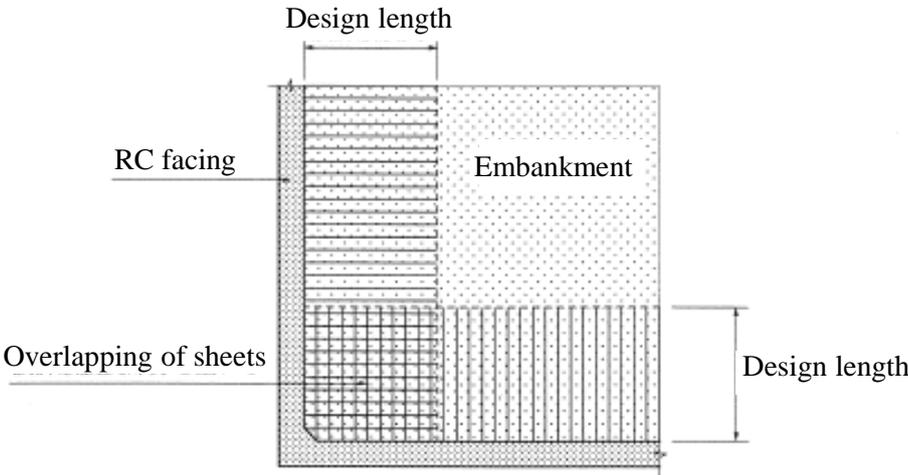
Arrangement of geotextile sheets at an outward-bent corner
